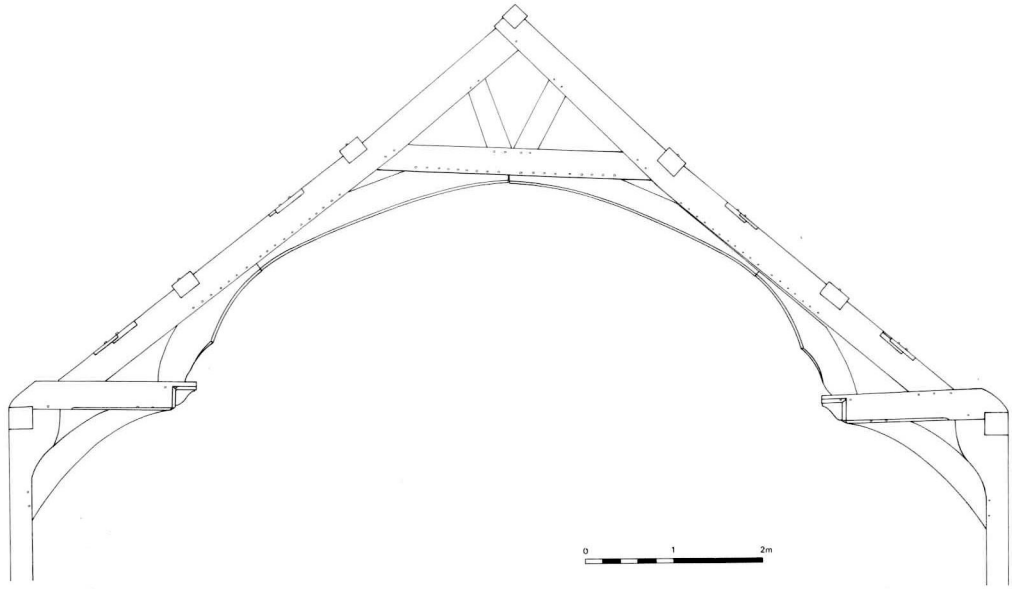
The central false hammerbeam truss in the abbey kitchen.
